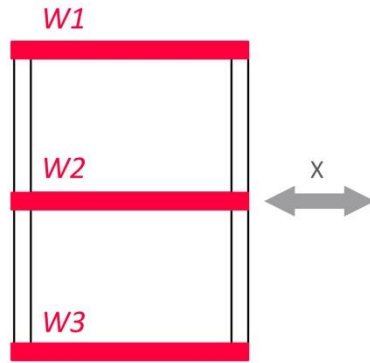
4: All earthquake resistant walls in the main direction under evaluation and the total area of wall openings in them should be taken into account (plan view)
